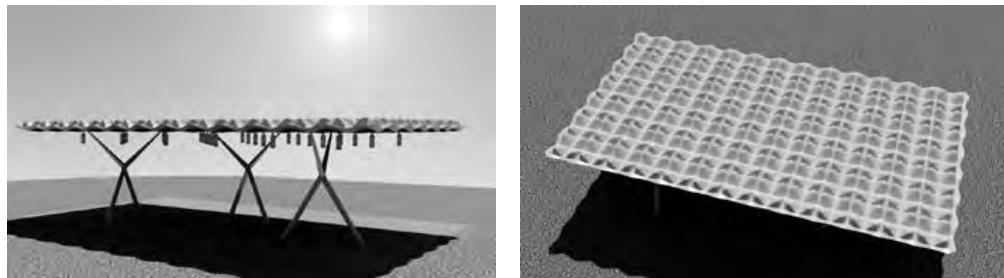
Perspective views of the pavilion: the roof and the pillars/roof in bird's eye view
